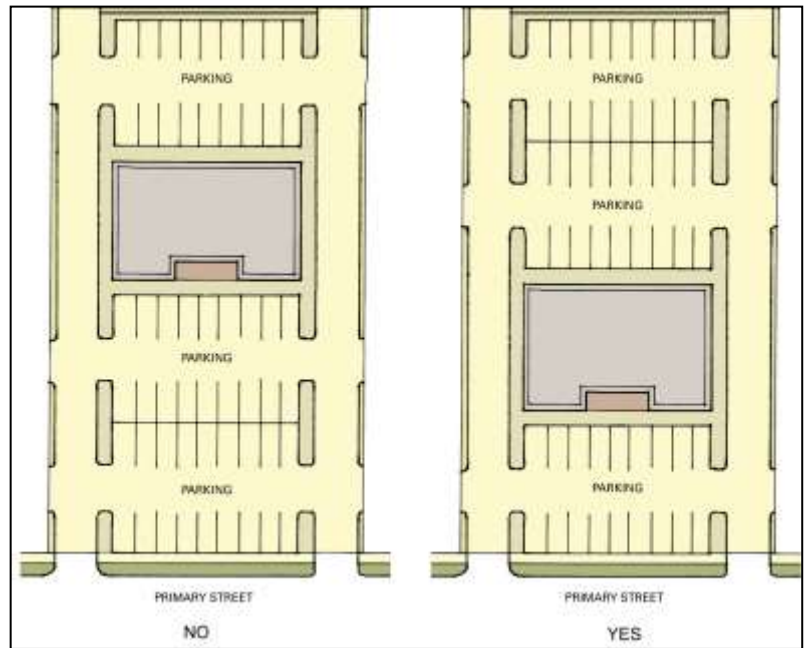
The site layout illustrates the appropriate number of parking aisles and bays between the street and structure for uses in a mixed-use PUD.
